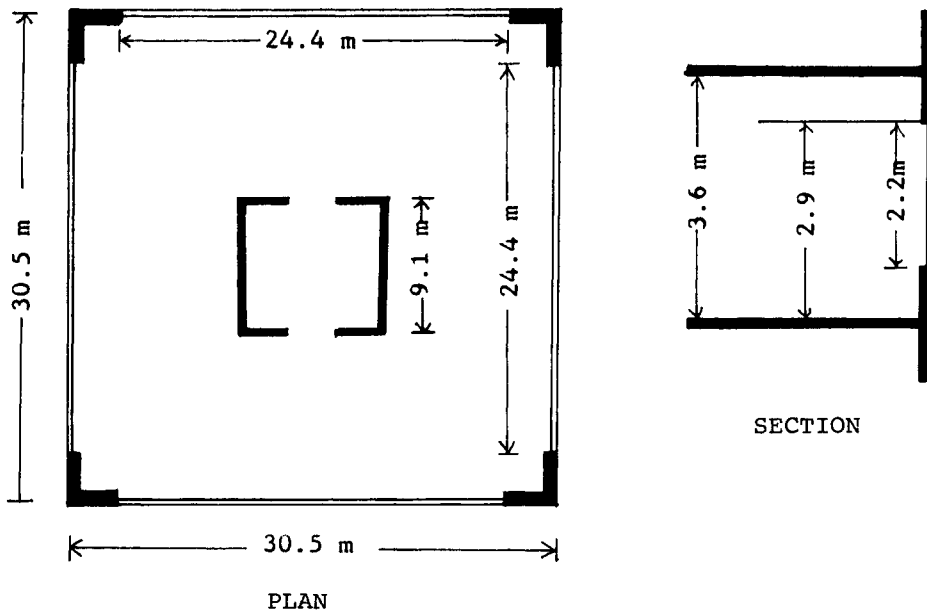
Plan and section of a typical floor of the building used for simulation studies
